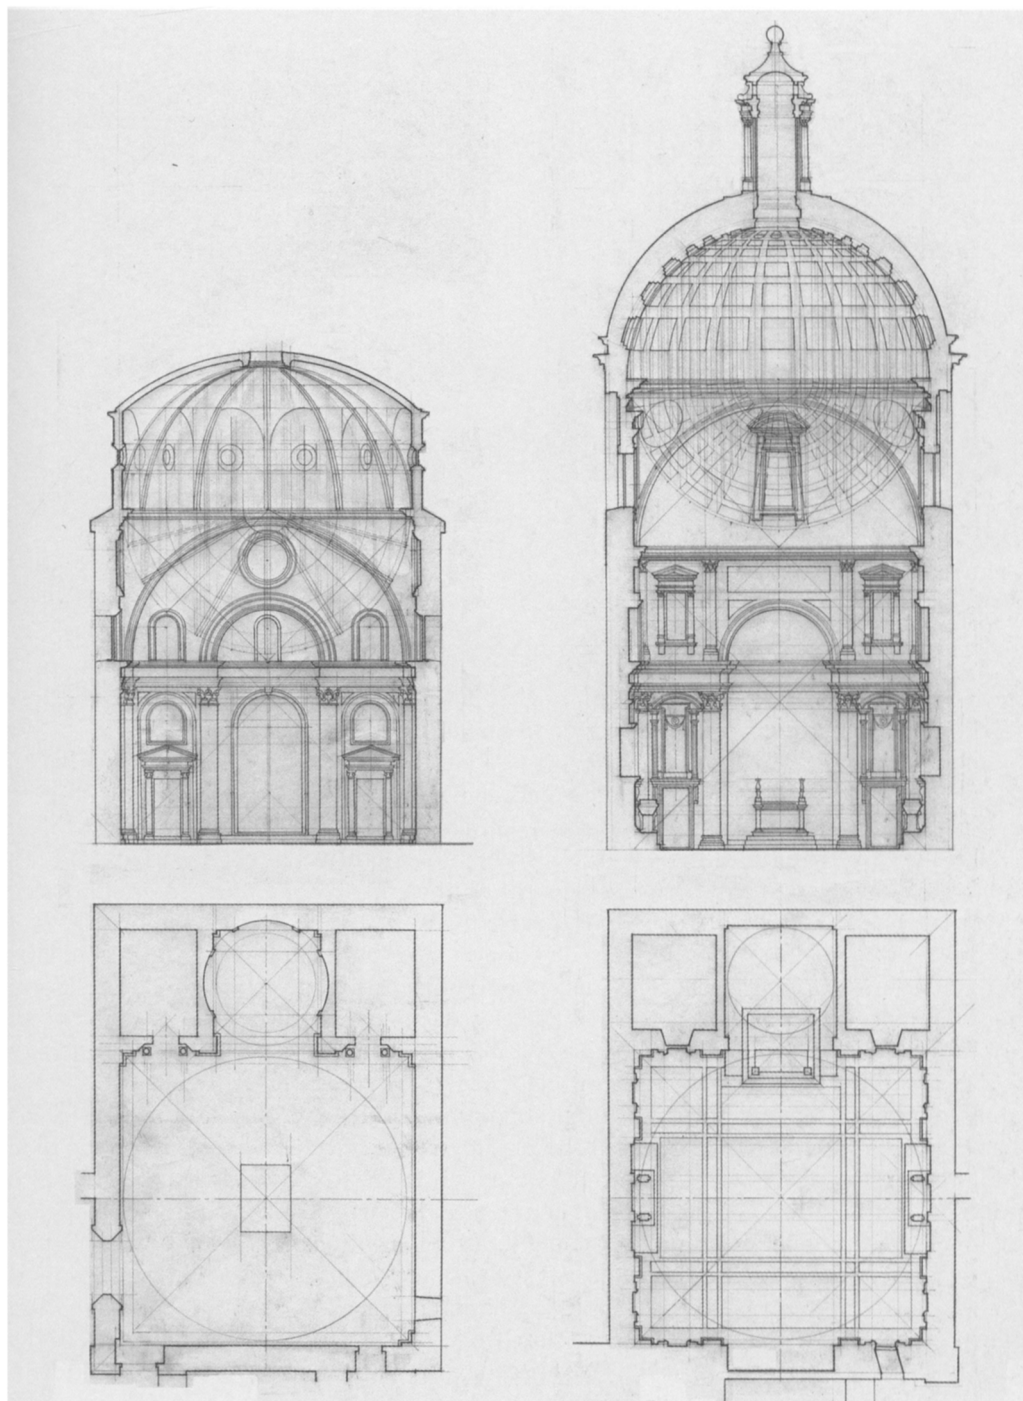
Left: Brunelleschi, section and plan of Old Sacristy, S. Lorenzo.
